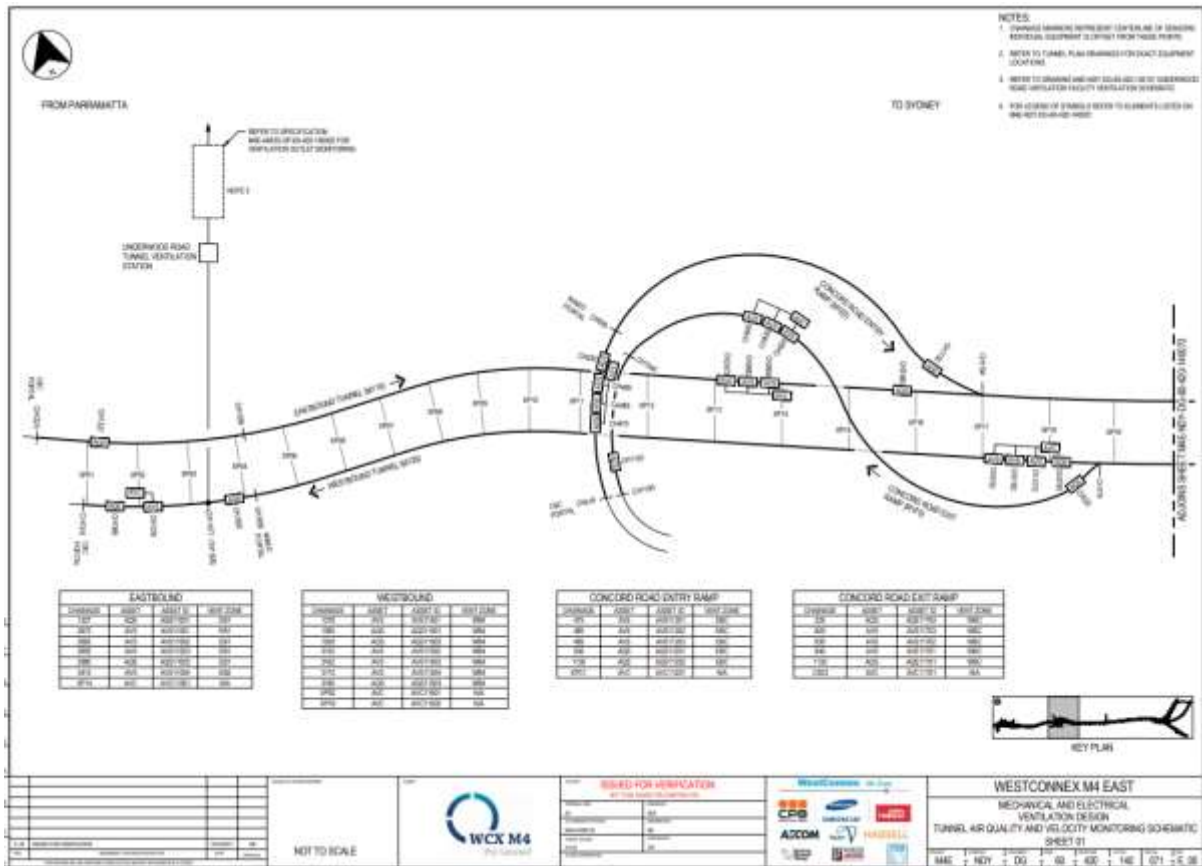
WestConnex M4 East In-Tunnel AQS Network Diagram 1
